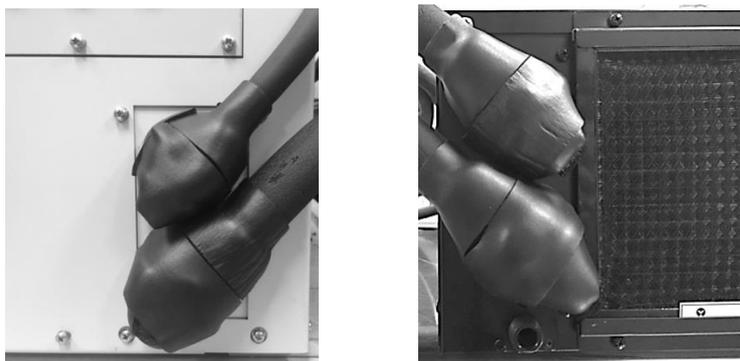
Keeping Copper Piping and Quick Thread Connector Insulated
